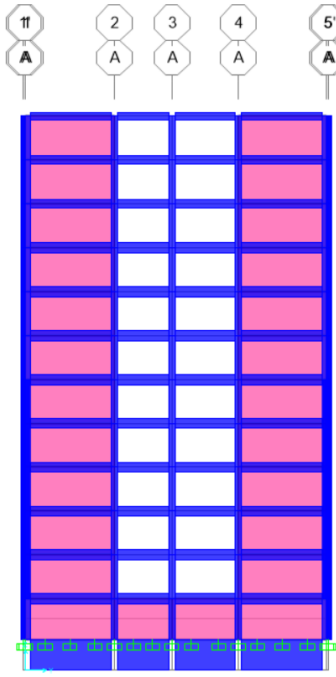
N-S Elevation of axis A without masonry infill (white)
